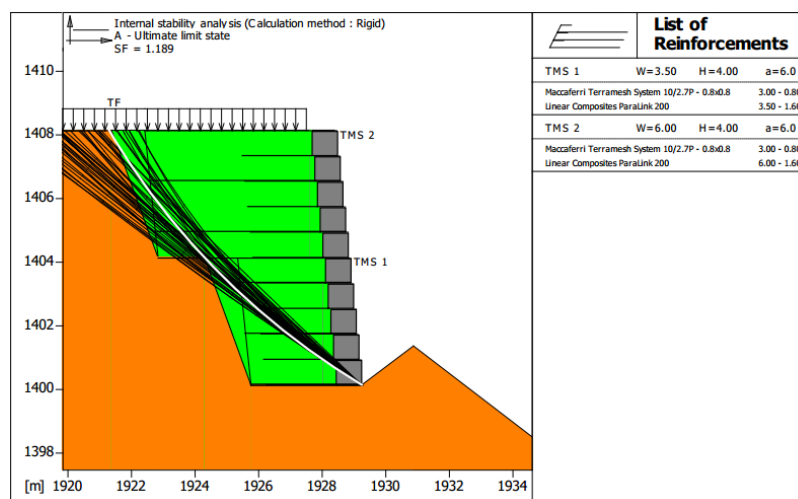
Slope stability analysis of 8m high reinforced soil wall
